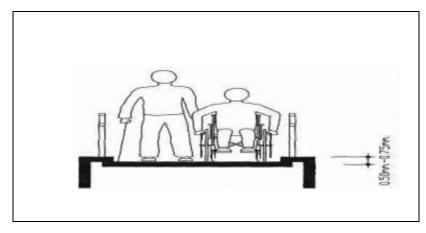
Low handrails and curb mounted to guide the disabled (Source: SOLIDERE, 2004)
